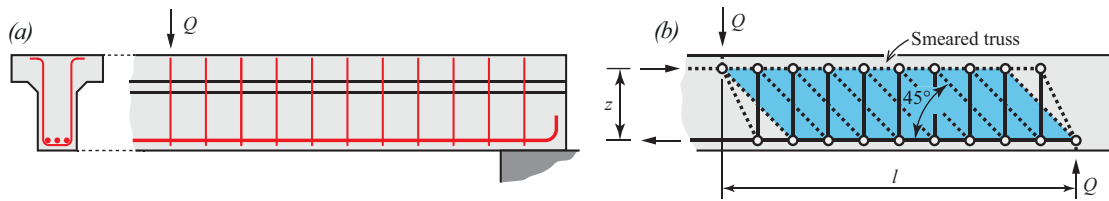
(a) RC beam with vertical stirrups tested by Mörsch; (b) smeared truss model
